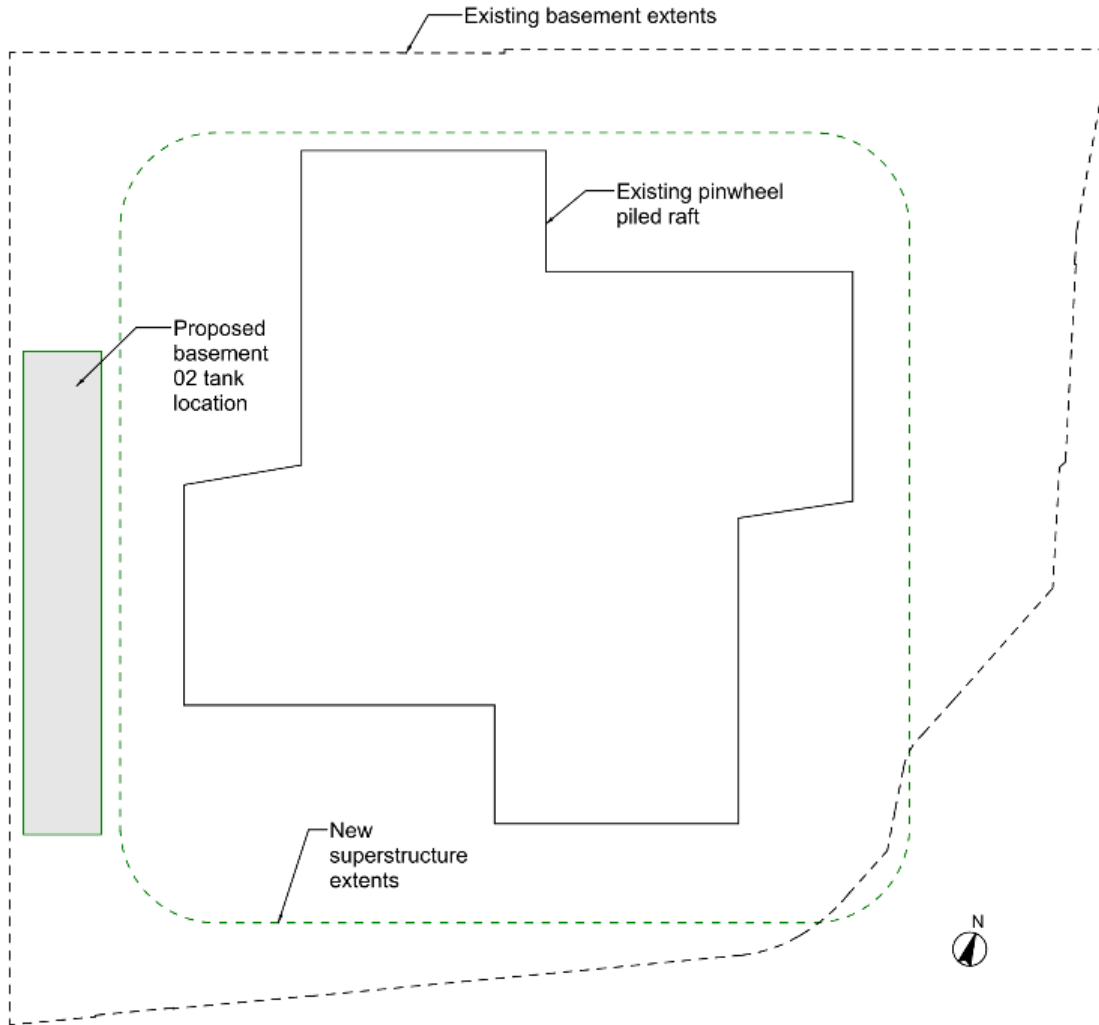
Proposed Basement 02 plan (extract from 3XN drawing no.: ET_DR-A_20098)
